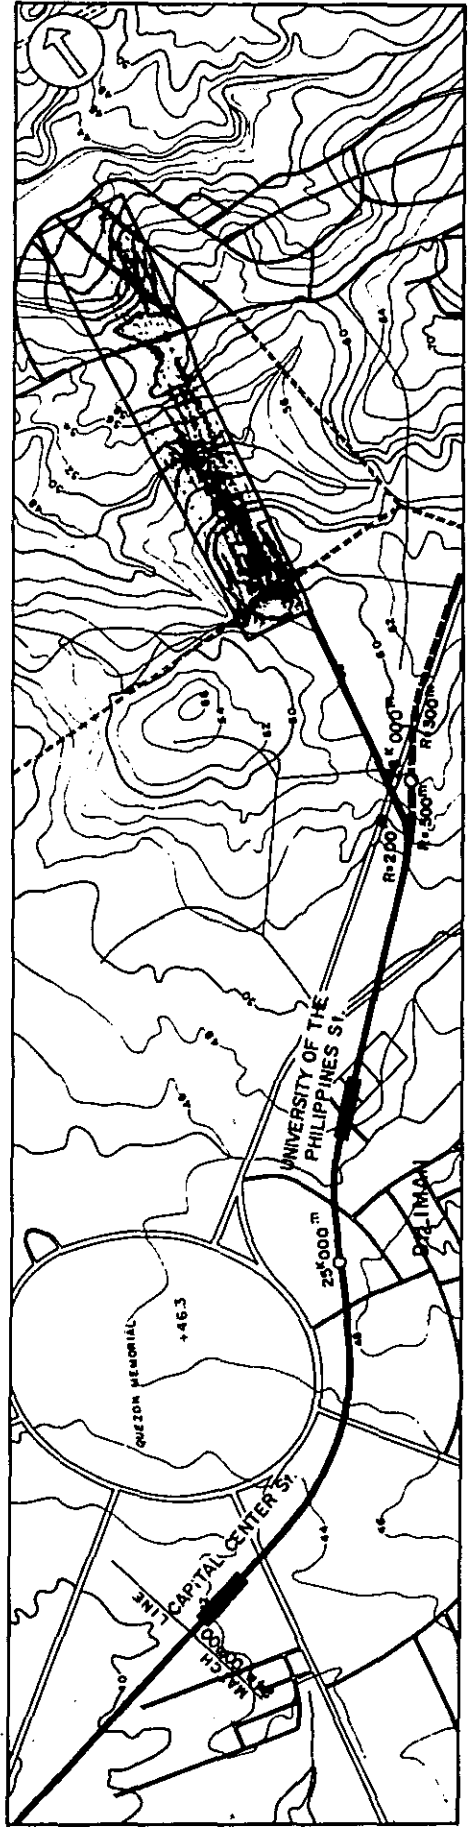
Plan and Profile of Recommended Alternative (8)
